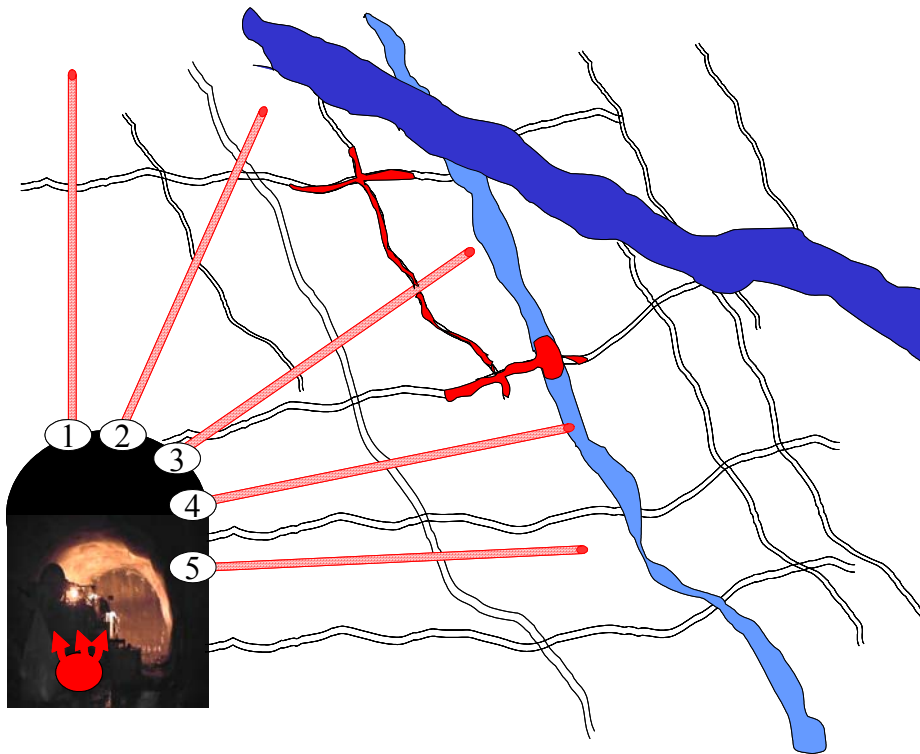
An erroneous grout order may block further sealing of the highly conductive joint. Red indicates grout holes and the penetration of grout in joints caused by grouting in hole 3. As can be seen an initial grouting of this hole may restrict further sealing.
